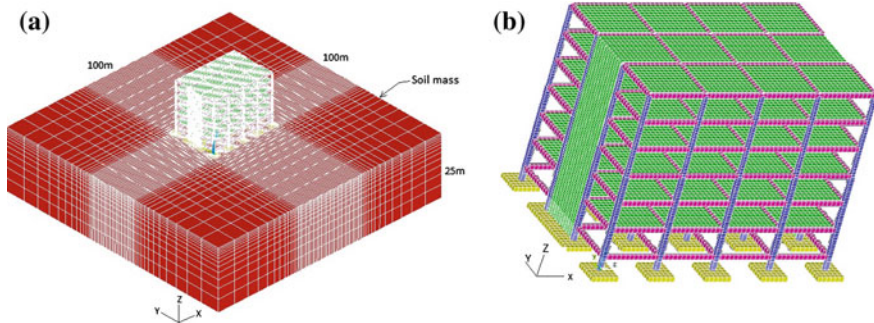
Finite element discretization of space frame-shear wall- soil system. a Complete system b space frame-shear wall-system
